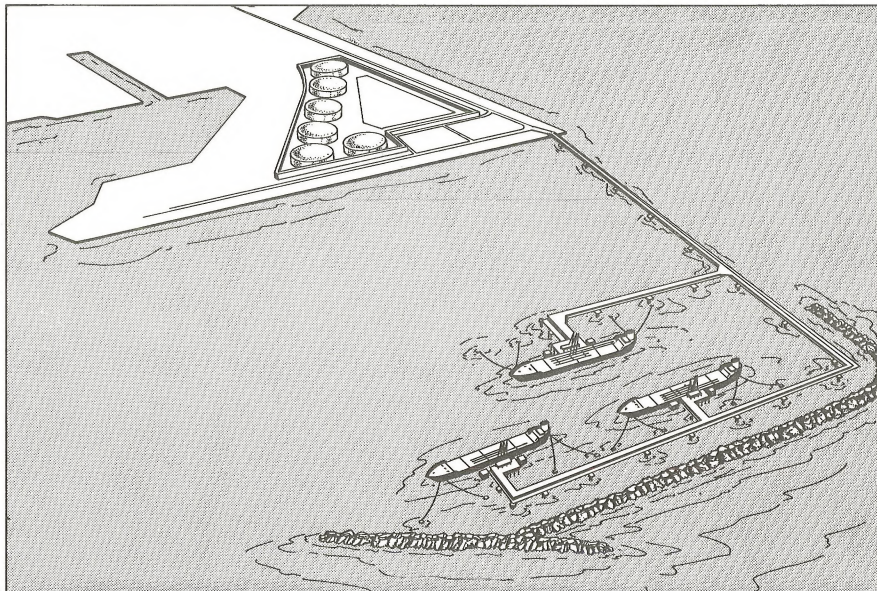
Long Beach Port facilities, proposed tanker berths, and tank farm
